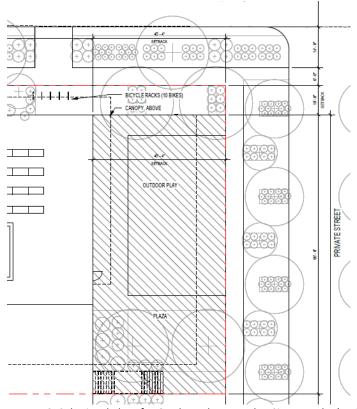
Submitted Plans for Outdoor Playground at Sites 4 and 5 (Multi-Family Residential).
